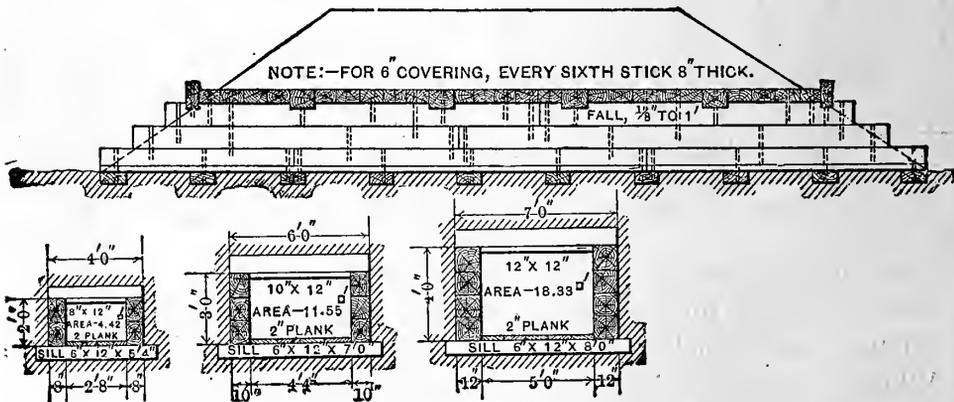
STANDARD TIMBER BOX CULVERT. C., M. & St. P. RY. (Feb. 1889.)
